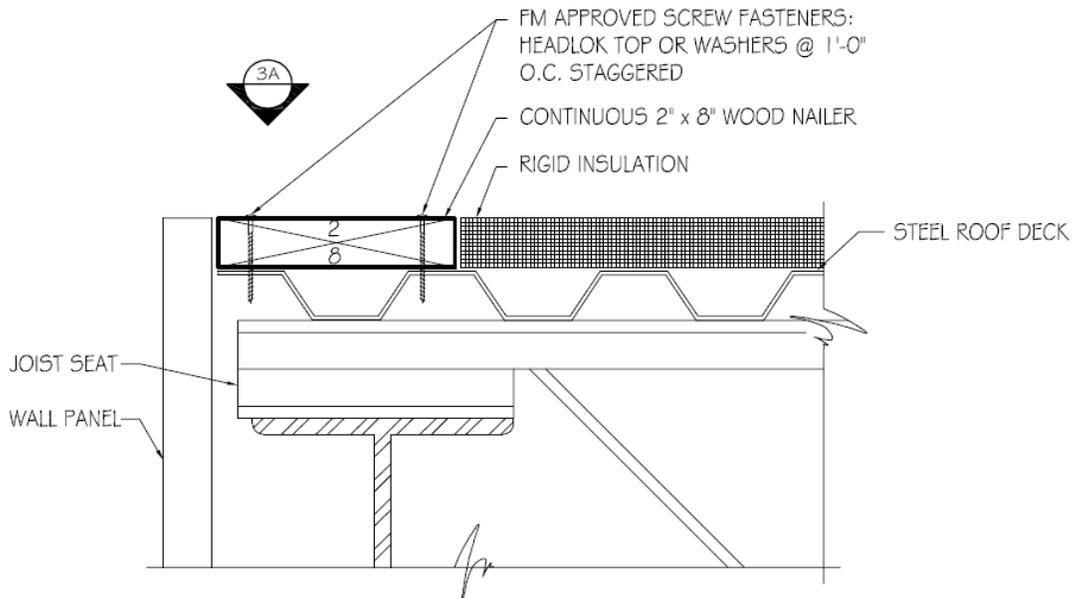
ROOF EDGE WOOD BLOCKING - SCREW FASTENER ANCHORAGE
